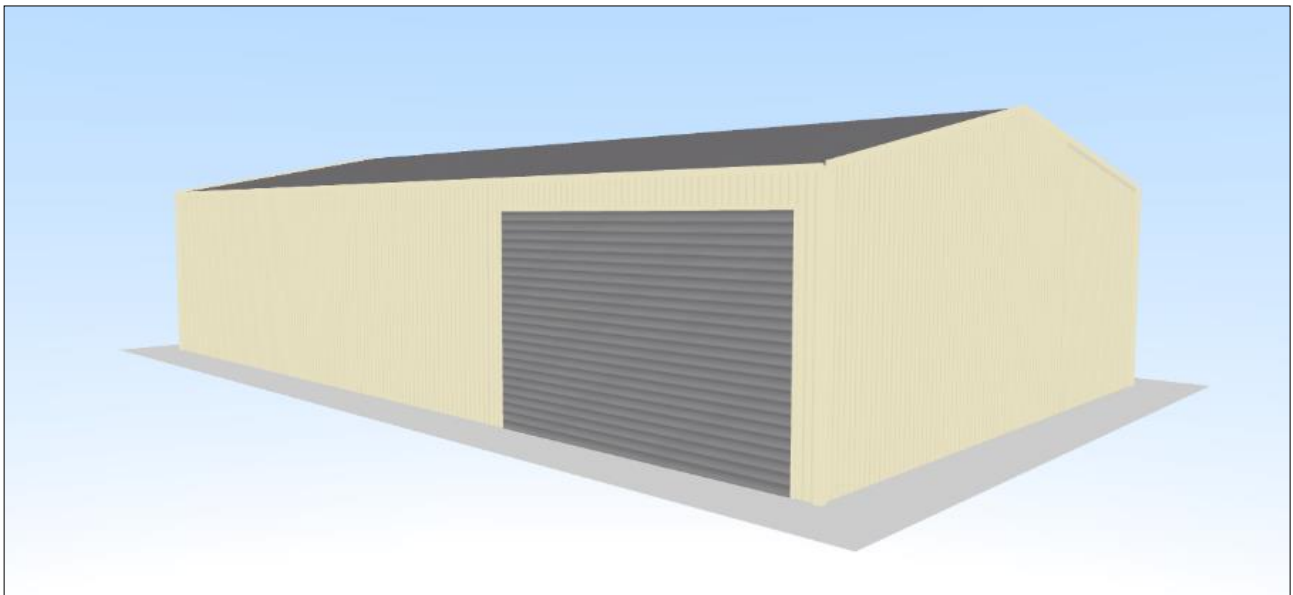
Visual depiction of the outbuilding (Devonport Building Supplies, 2021)
